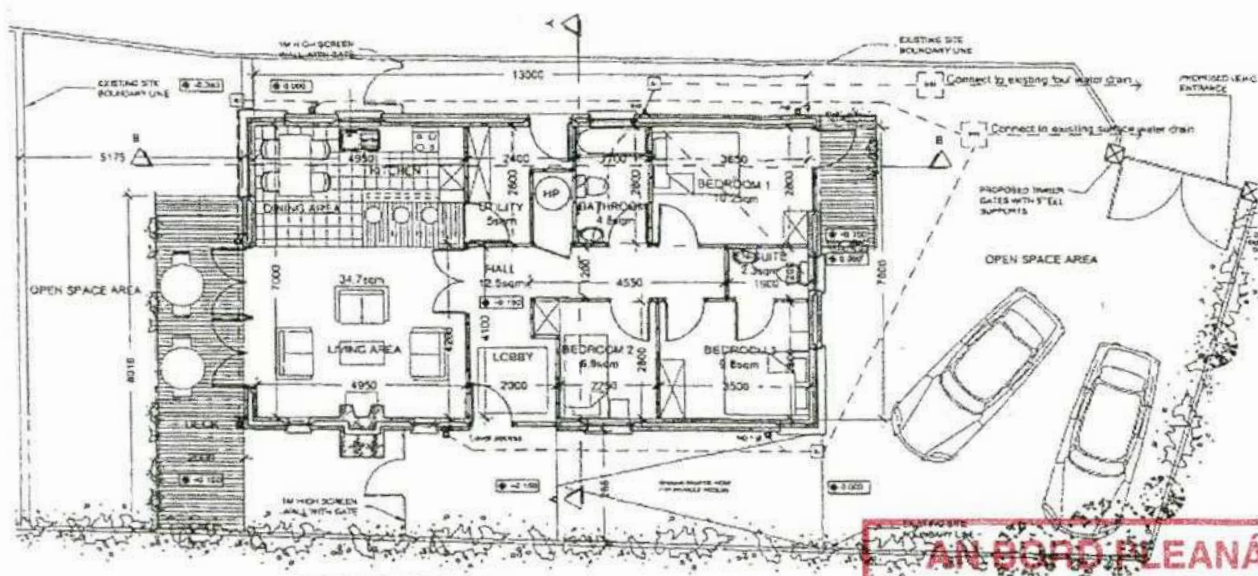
Site plan approved under. Reg. Ref. D05A/0427 which is located at the end of the laneway to the rear of the subject site.
